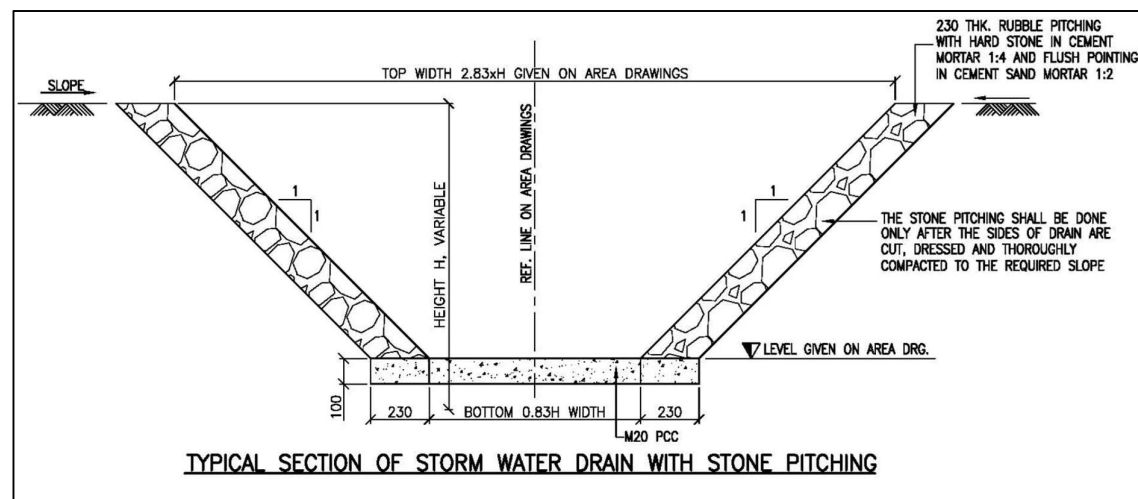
Typical Example of a Trapezoidal Channel Cross-section
